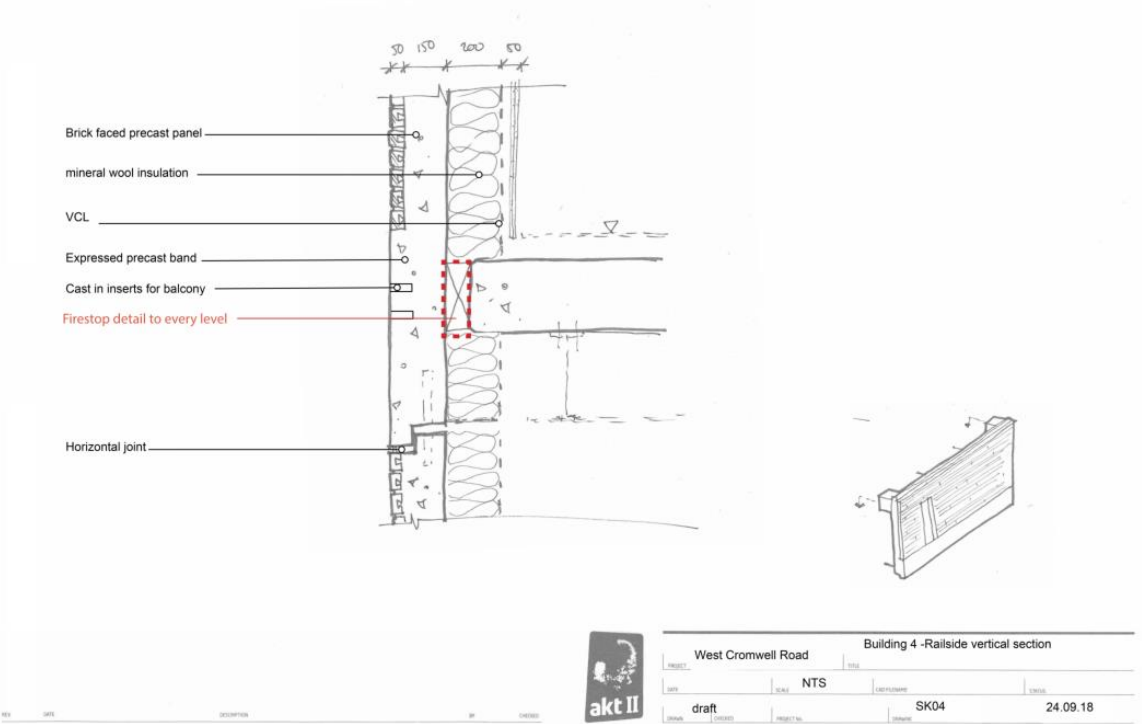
Building 3,4,5 - Wall Detail Railway Facing
